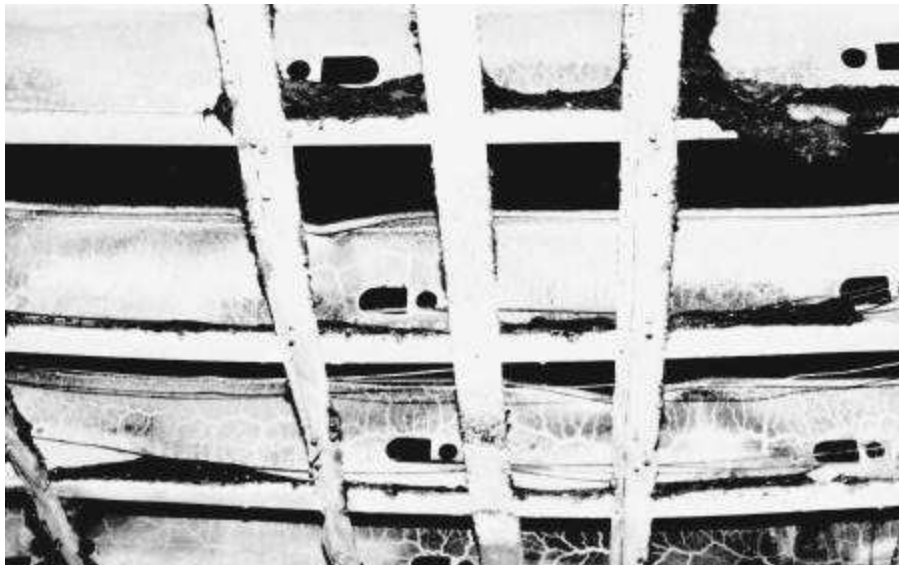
Compressive Failure (Local Buckling) of Top Flanges near Mid-Span.
